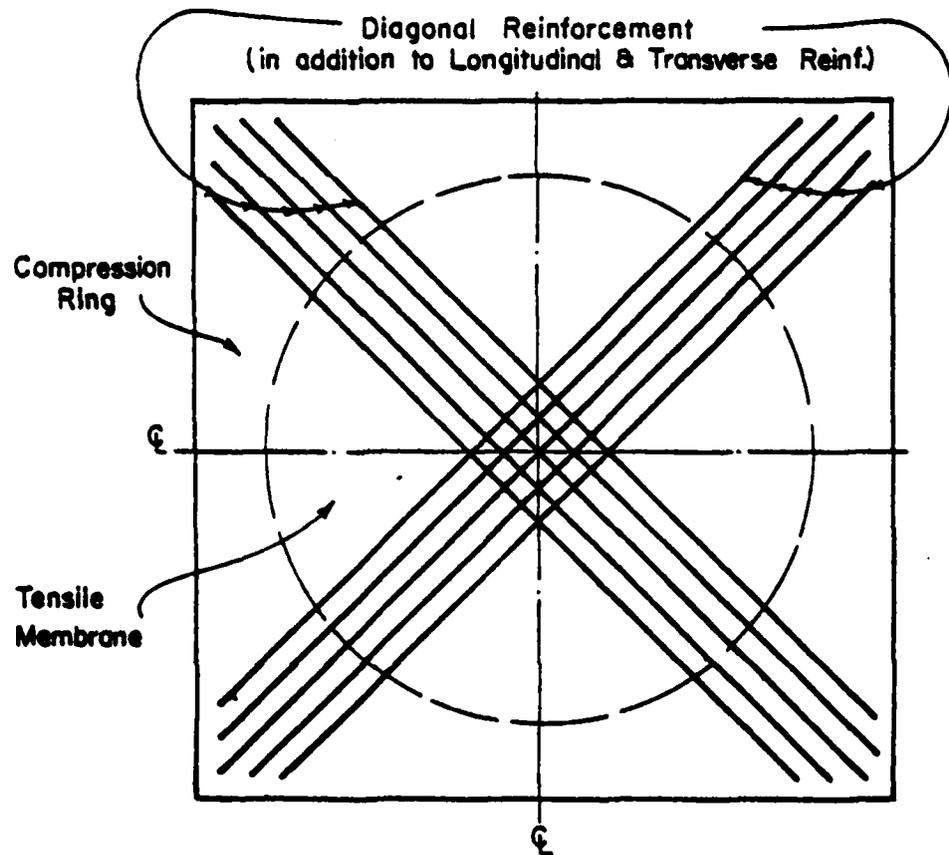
Recommended Construction Details for Restrained Slabs
